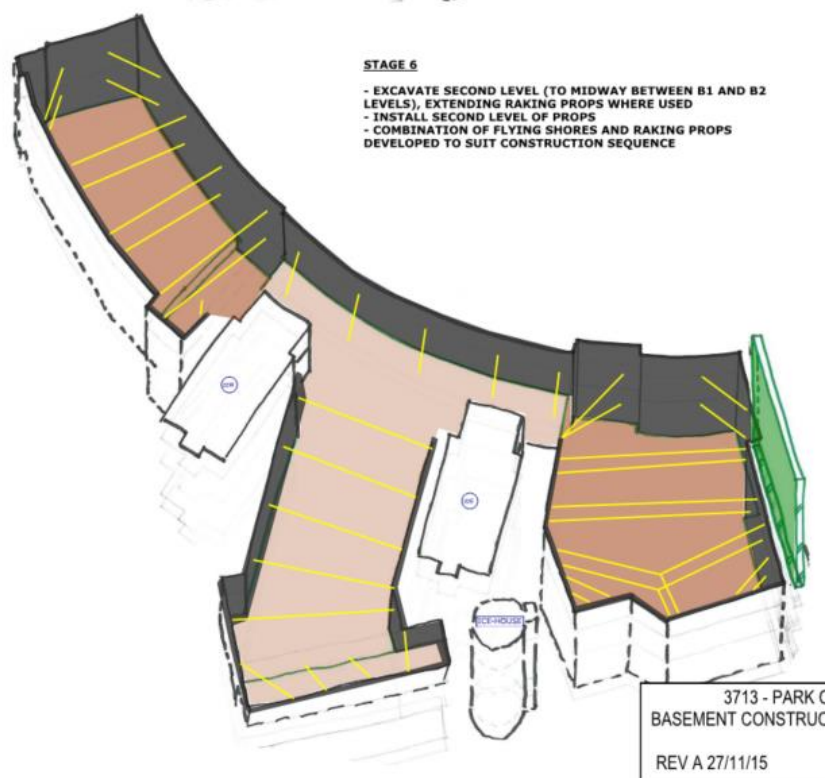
Proposed basement excavation over and in proximity of existing tunnels
